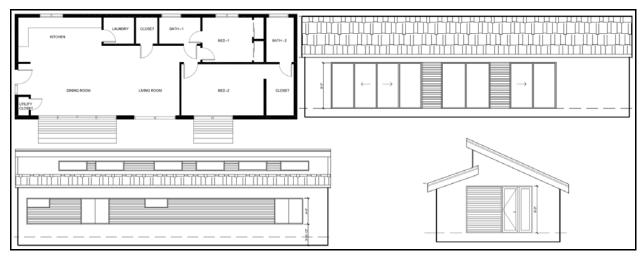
Proposed Type 1 Manager Units – Floor Plan and Elevations
